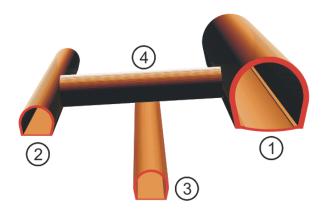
Example option 1: Seikan subsea tunnel; (1) main tunnel, (2) service tunnel, (3) pilot tunnel, and (4) connecting gallery
